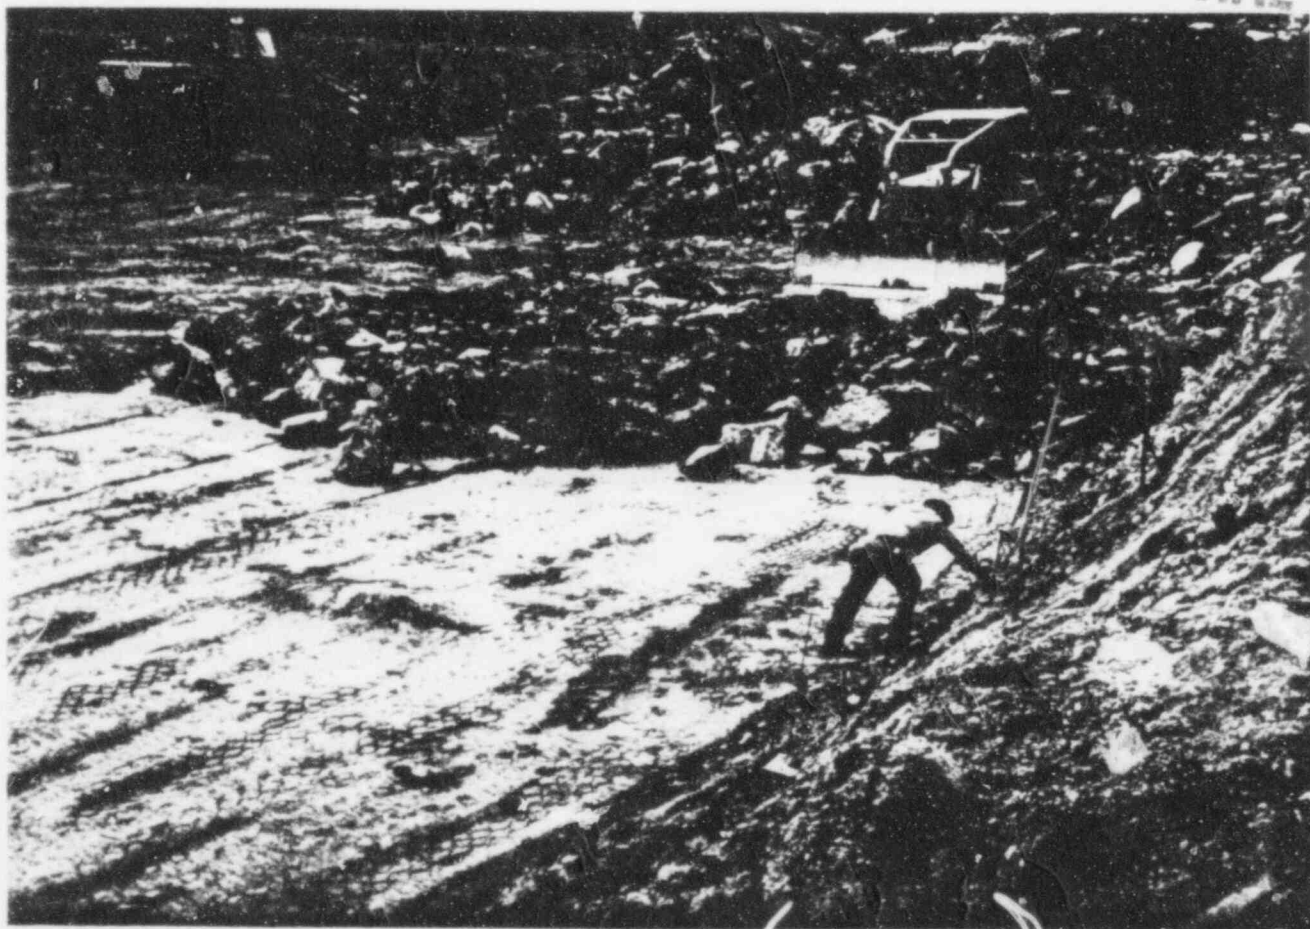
Spreading of Rock to 24 inch nominal lift thickness with dozer.
